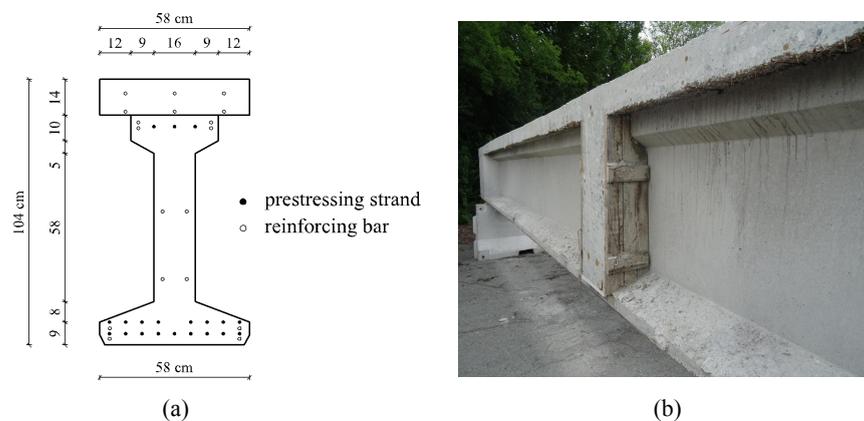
PC deck beam and top slab: (a) cross-section; (b) longitudinal view.
